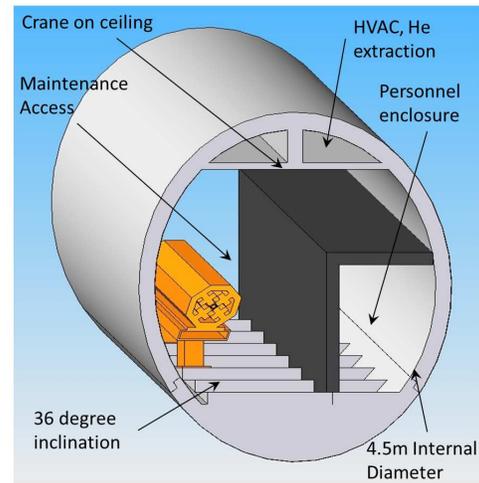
Cross-section of the decay ring tunnel showing the stepped floor and personnel enclosure.
